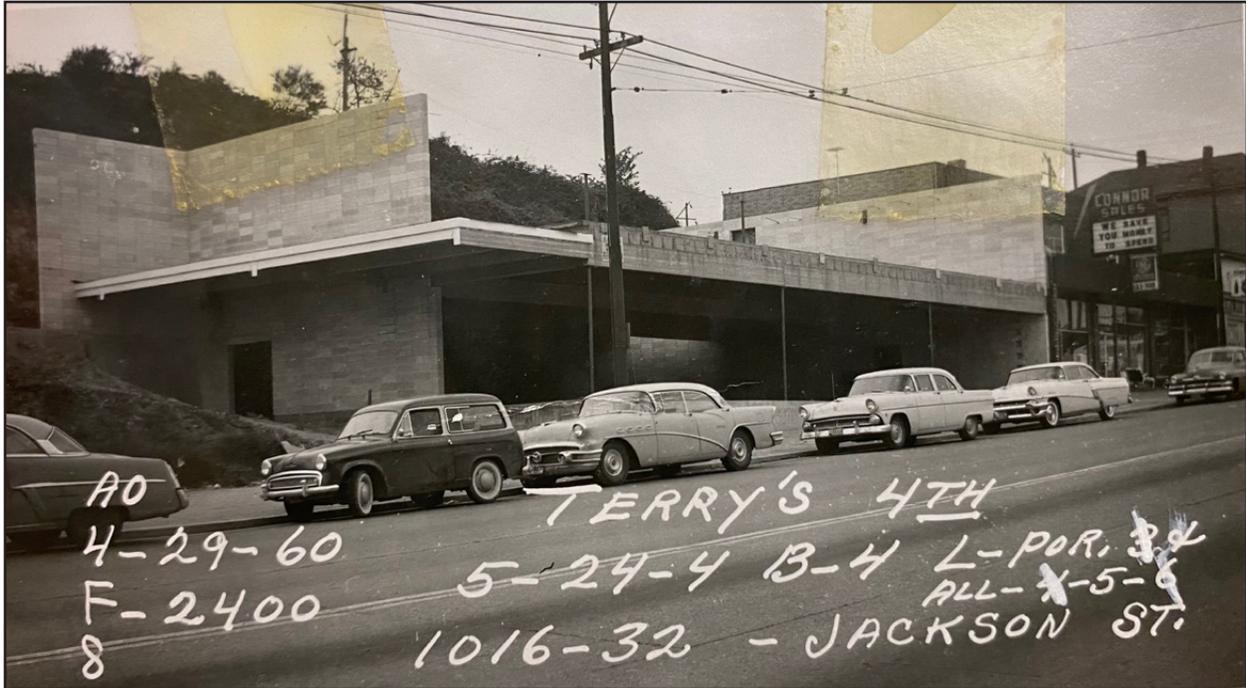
• Tax Assessor photo of subject building under construction, 1960.
